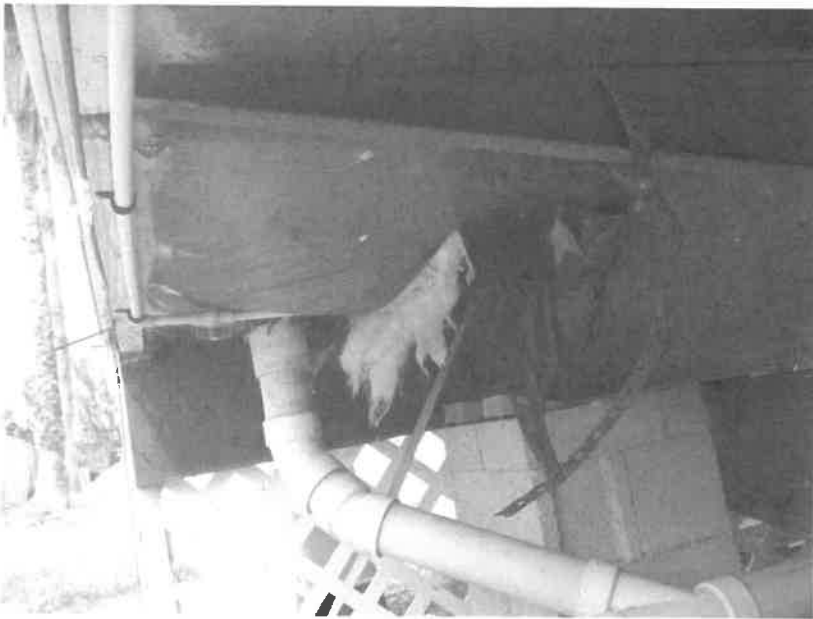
One area of damage (north west corner) to insulation and bottom of building
